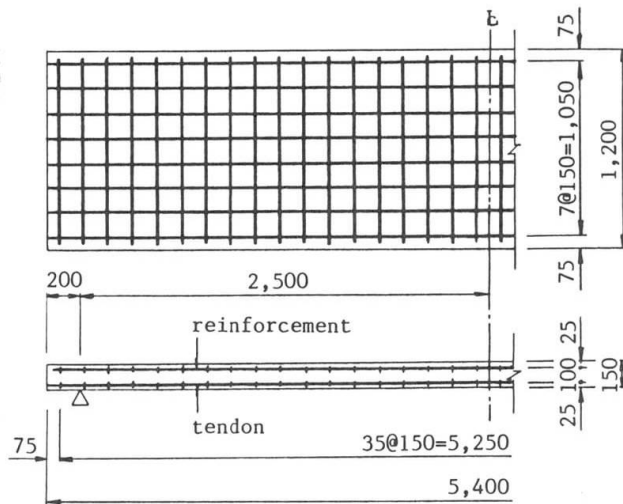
Tendon and reinforcement of prestressed concrete slab
